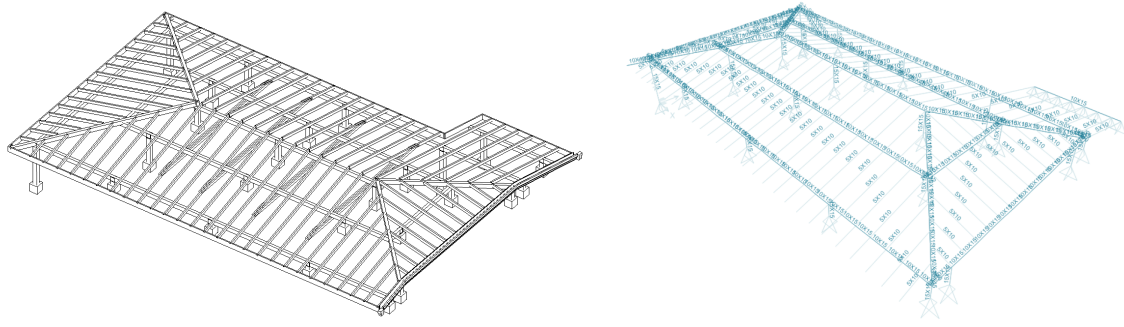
Sıcaklık* roof, (a) Revit model, (b) SAP2000 model
